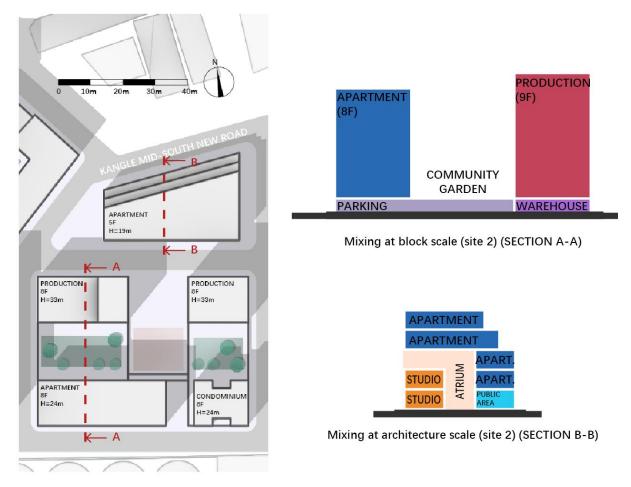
Plan and sections of mixing at block scale (site 2) & mixing at architecture scale (site 2) (source: the author)
